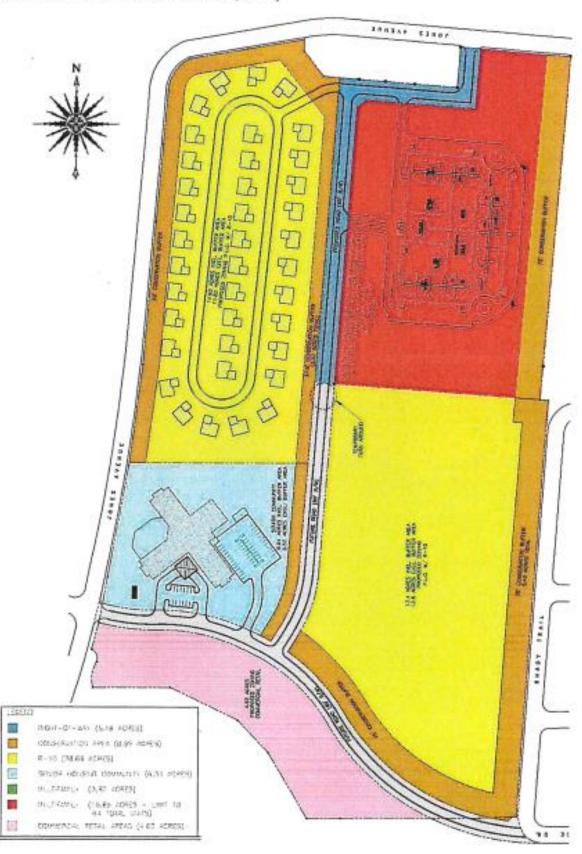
Approved Site Plan & Current 2010 Approved Site Plan (continued)
